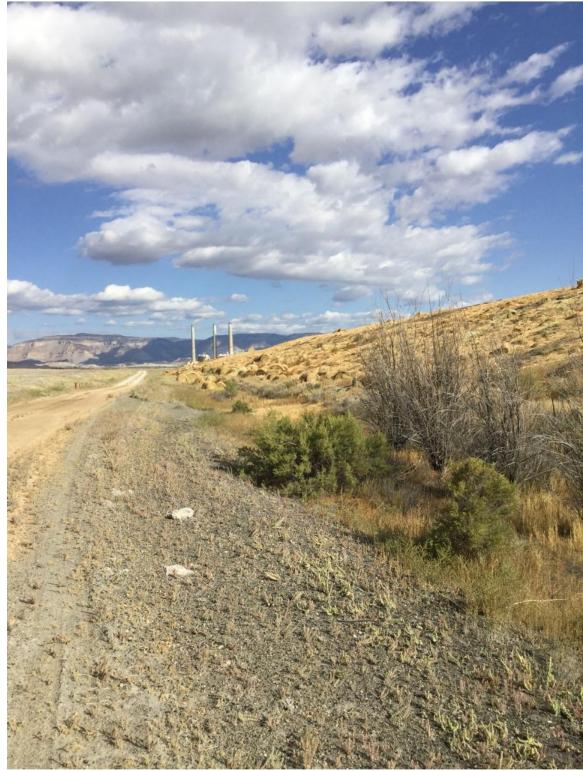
View of interior slope of perimeter berm and perimeter road, looking southeast.
